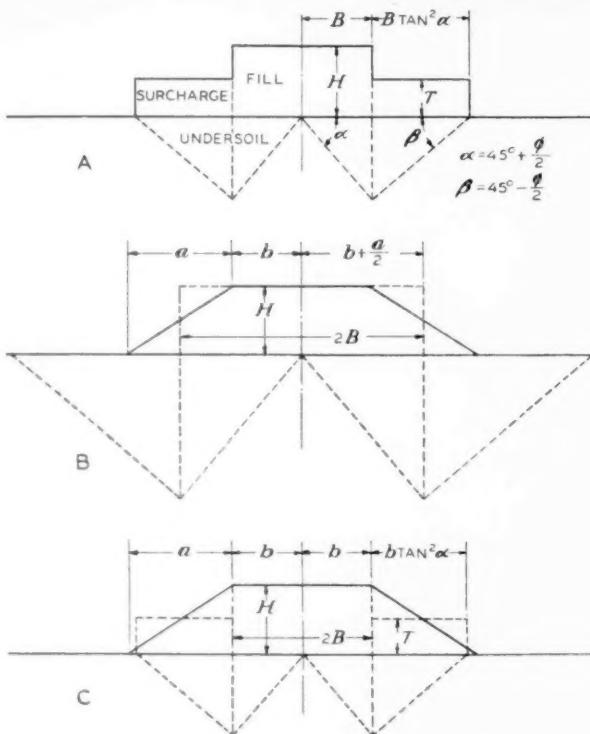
MODIFIED EMBANKMENT CROSS SECTIONS.
